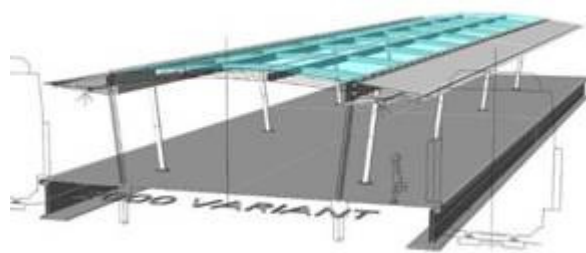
Artist impression of new platform canopy with central section made of curved glass elements. (source: Benthem Crouwel Architects)
